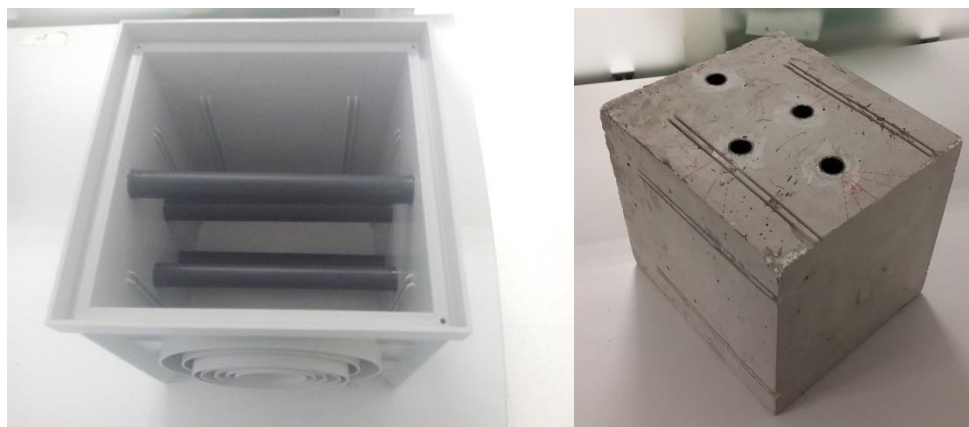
Formwork (left) and concrete box (right) for laboratory testing of reading range
